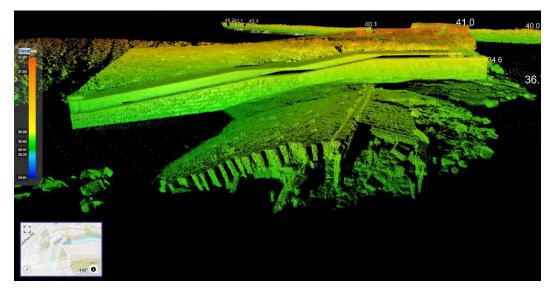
Weir elevation data looking towards the right bank (May 2021)
